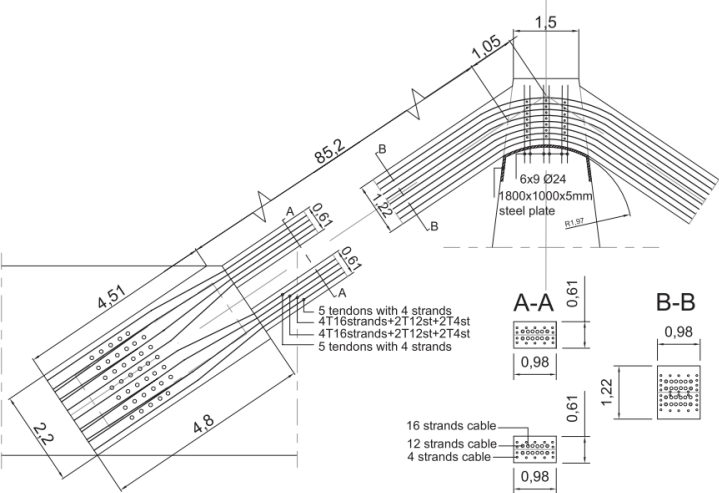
Details of Morandi Bridge cable-stay reinforcement
